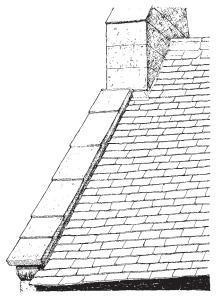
Verge slating can oversail the wallhead by 1 or 2" (25 to 50 mm) or finish against a raised outer wall which is coped. The latter is thought to be intended to prevent wind damage and is probably a legacy of thatching. On vernacular buildings, the abutment is often only applied to the most wind-susceptible gable but is common on all gables of professionally designed buildings, such as churches. It is often difficult to make a watertight joint, resulting in the adoption of secret gutters which need regular cleaning to prevent them becoming blocked with leaves and other debris and leaking. Illustration: Ray Harrison
